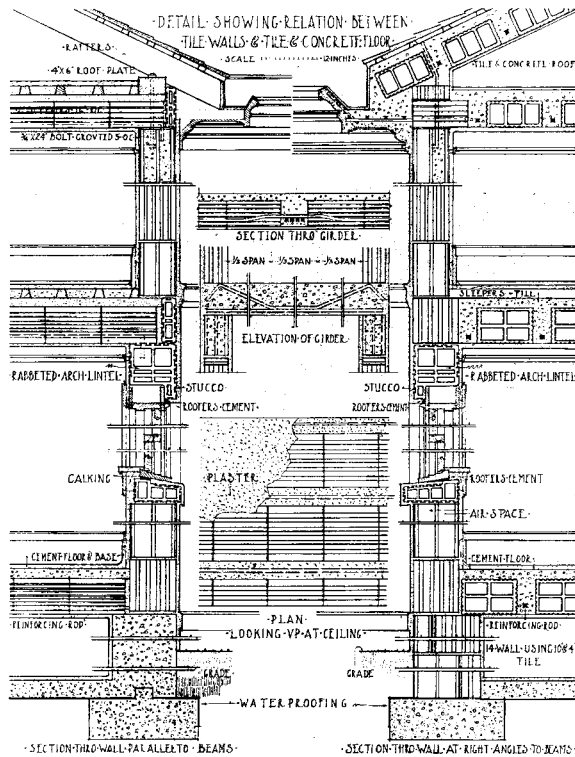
Example of the combination of hollow tile and cement for structural purposes (from National Fire Proofing Co., *Builders Handbook of Natco Hollow Tile Construction*, 23).
